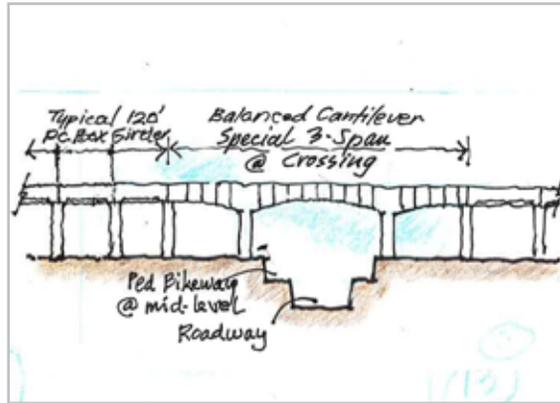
Long span haunched girder at street crossing and typical viaduct with constant depth girder and column spacing
